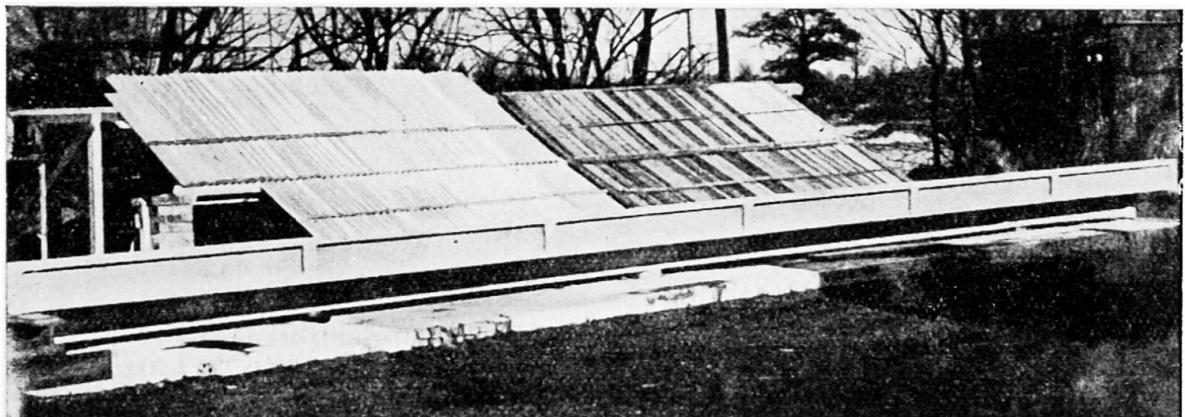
Prestressed concrete joist. Depth-span ratio 1:45.
